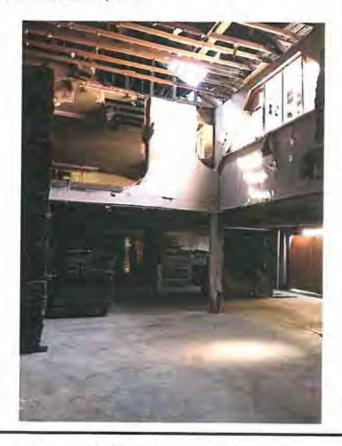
View of northern portion of the subject property building, looking southwest. Photograph taken August 16, 2017.
